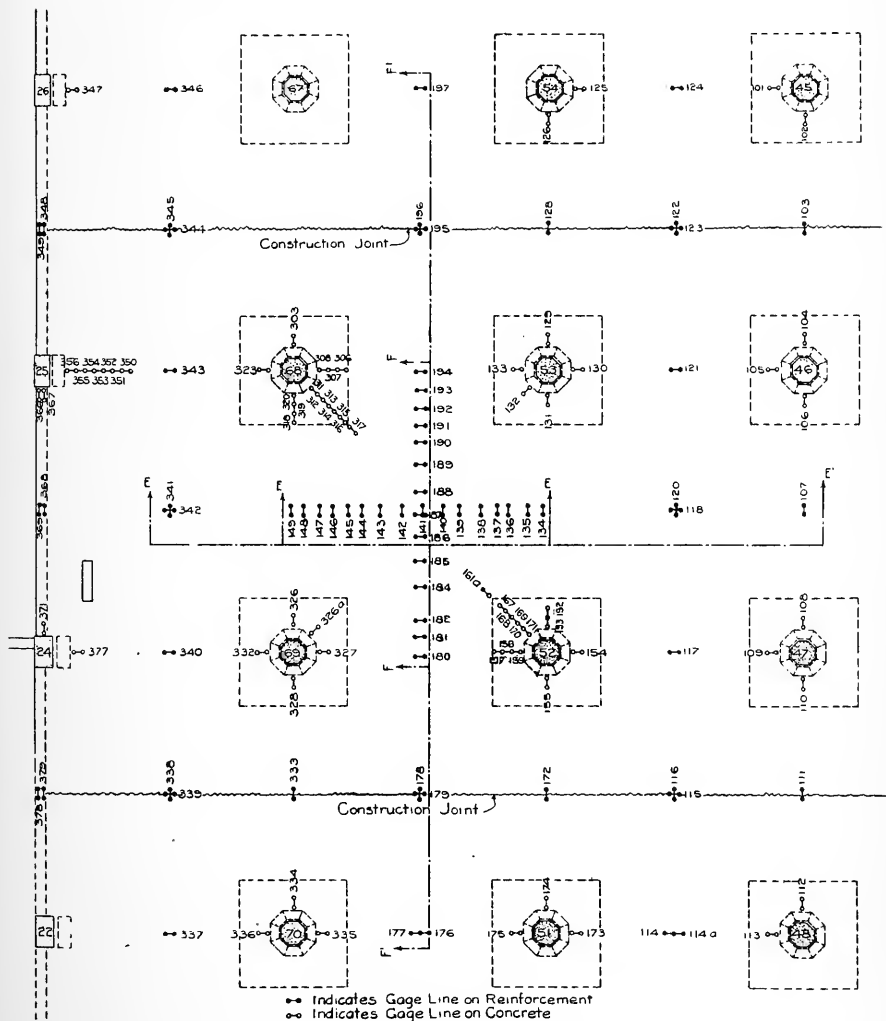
LOCATION OF GAGE LINES ON UNDER SURFACE OF TEST FLOOR OF SHREDDED WHEAT FACTORY.
